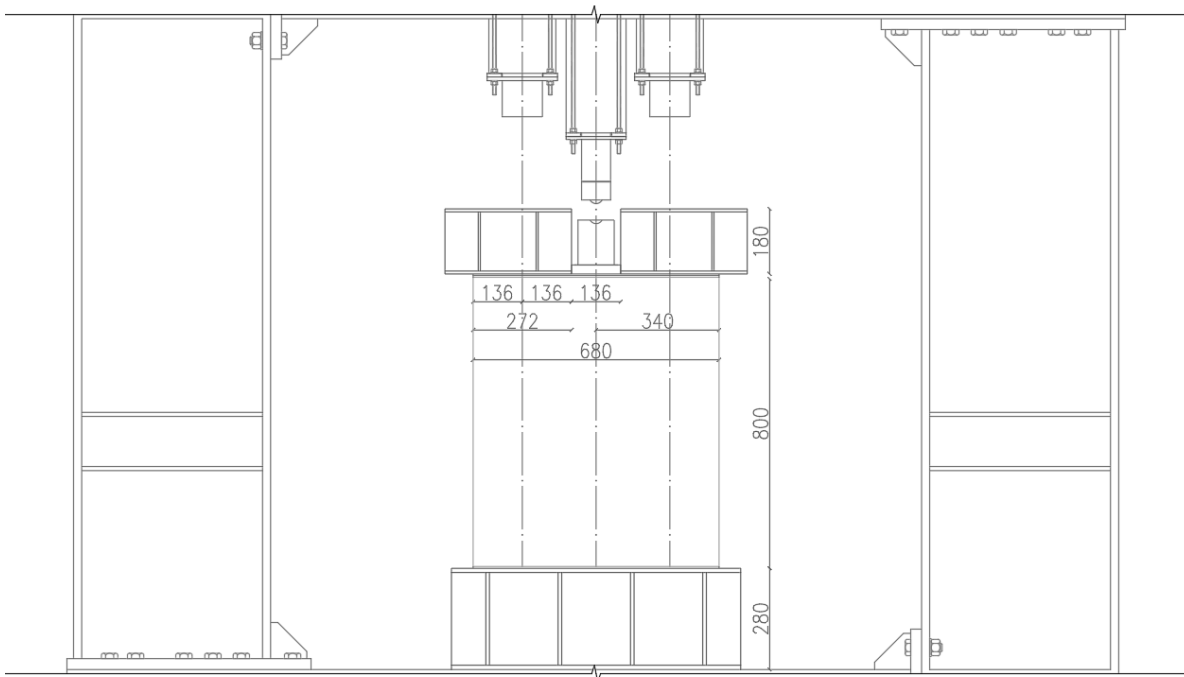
Testing rig setup dimensions for $A_b/A_{eff} = 0.2$ (concrete batch 1)
